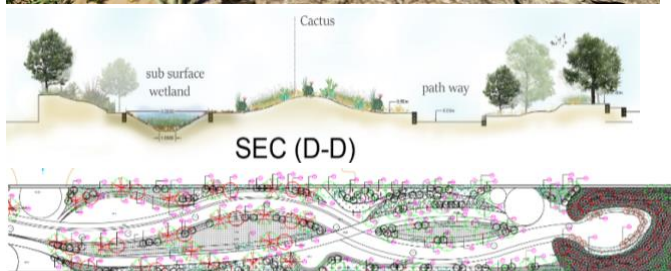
10th of Ramadan constructed wetland Park detailed with plan and section by (Author)Source: <https://youtu.be/icr7e75xjp0>
